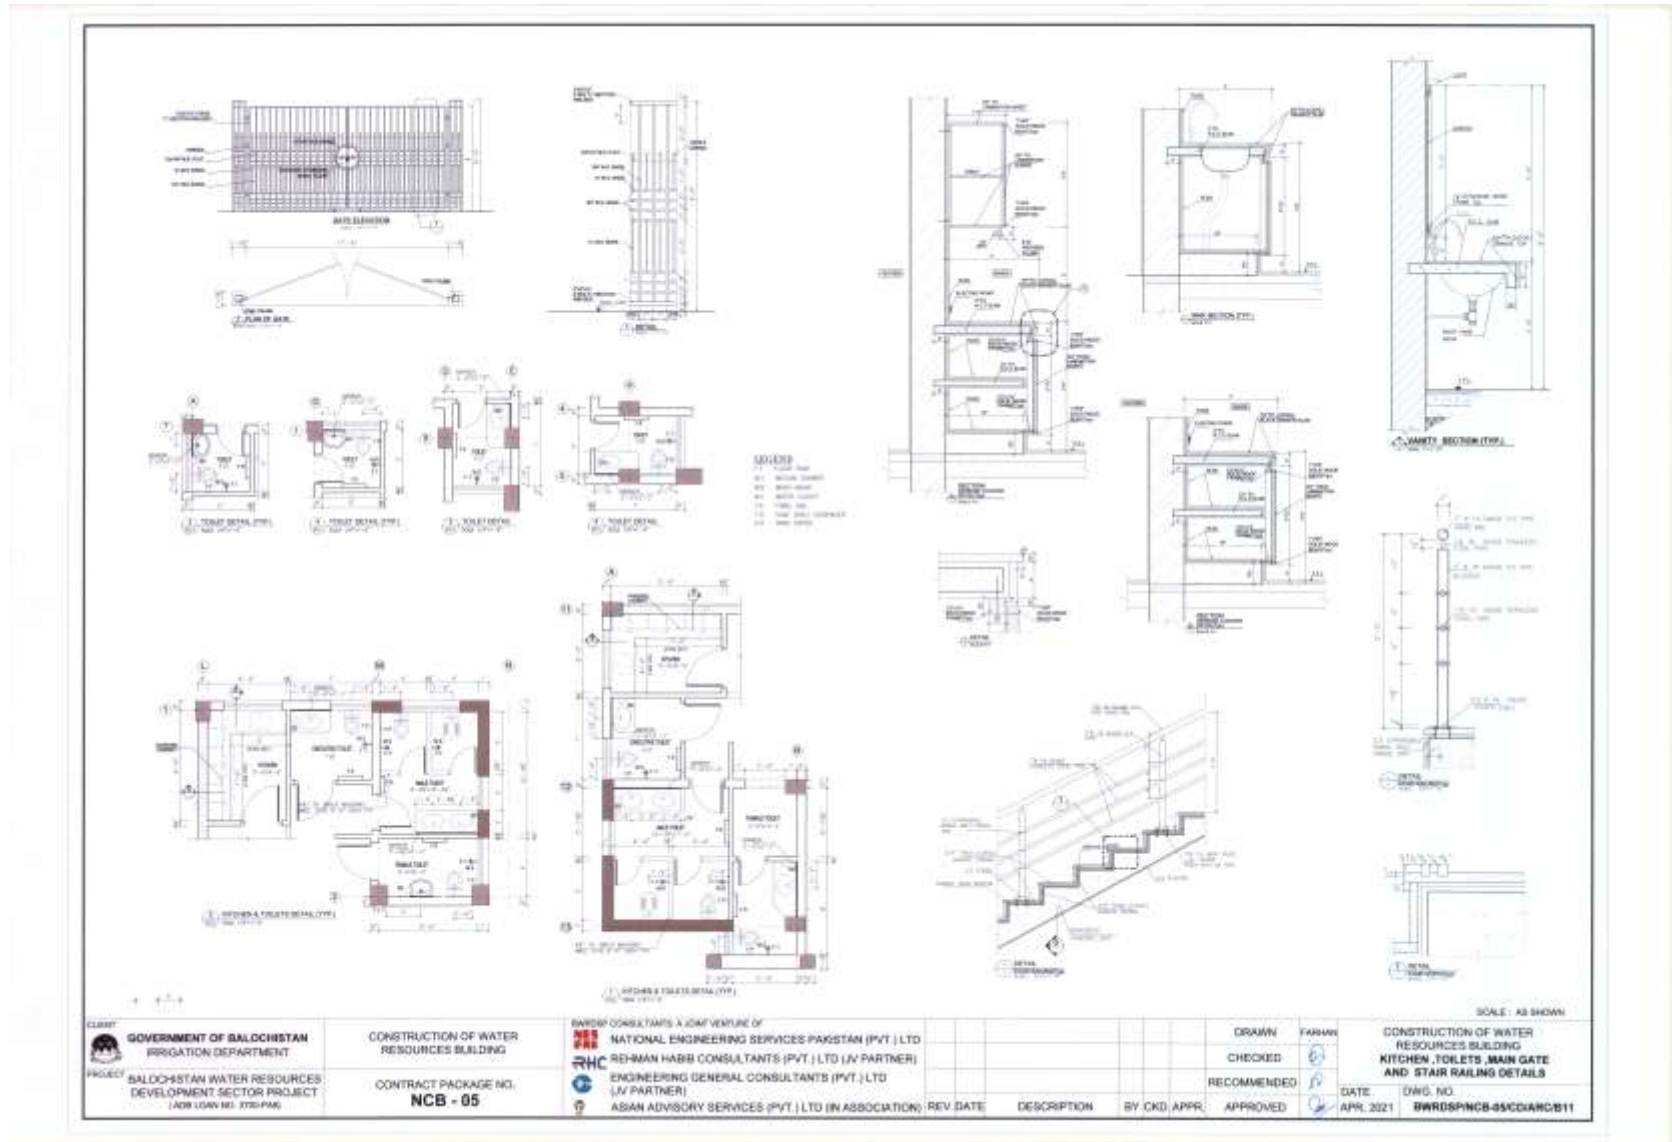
Kitchen, Toilets, Main Gate and Stair Railing Details
